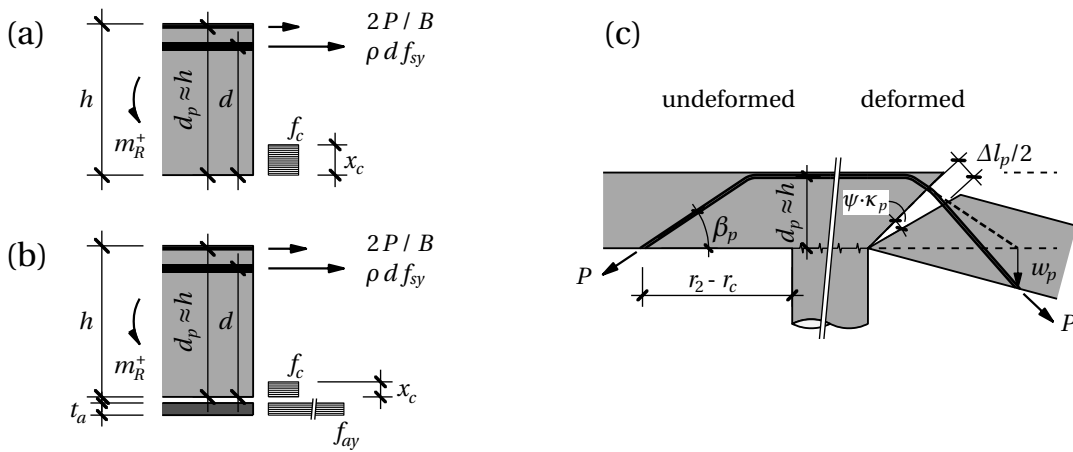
Free-body diagrams of strengthened RC slabs for (a) adhesively-bonded anchors and (b) steel frames; (c) concept of strap elongation due to slab deformation
